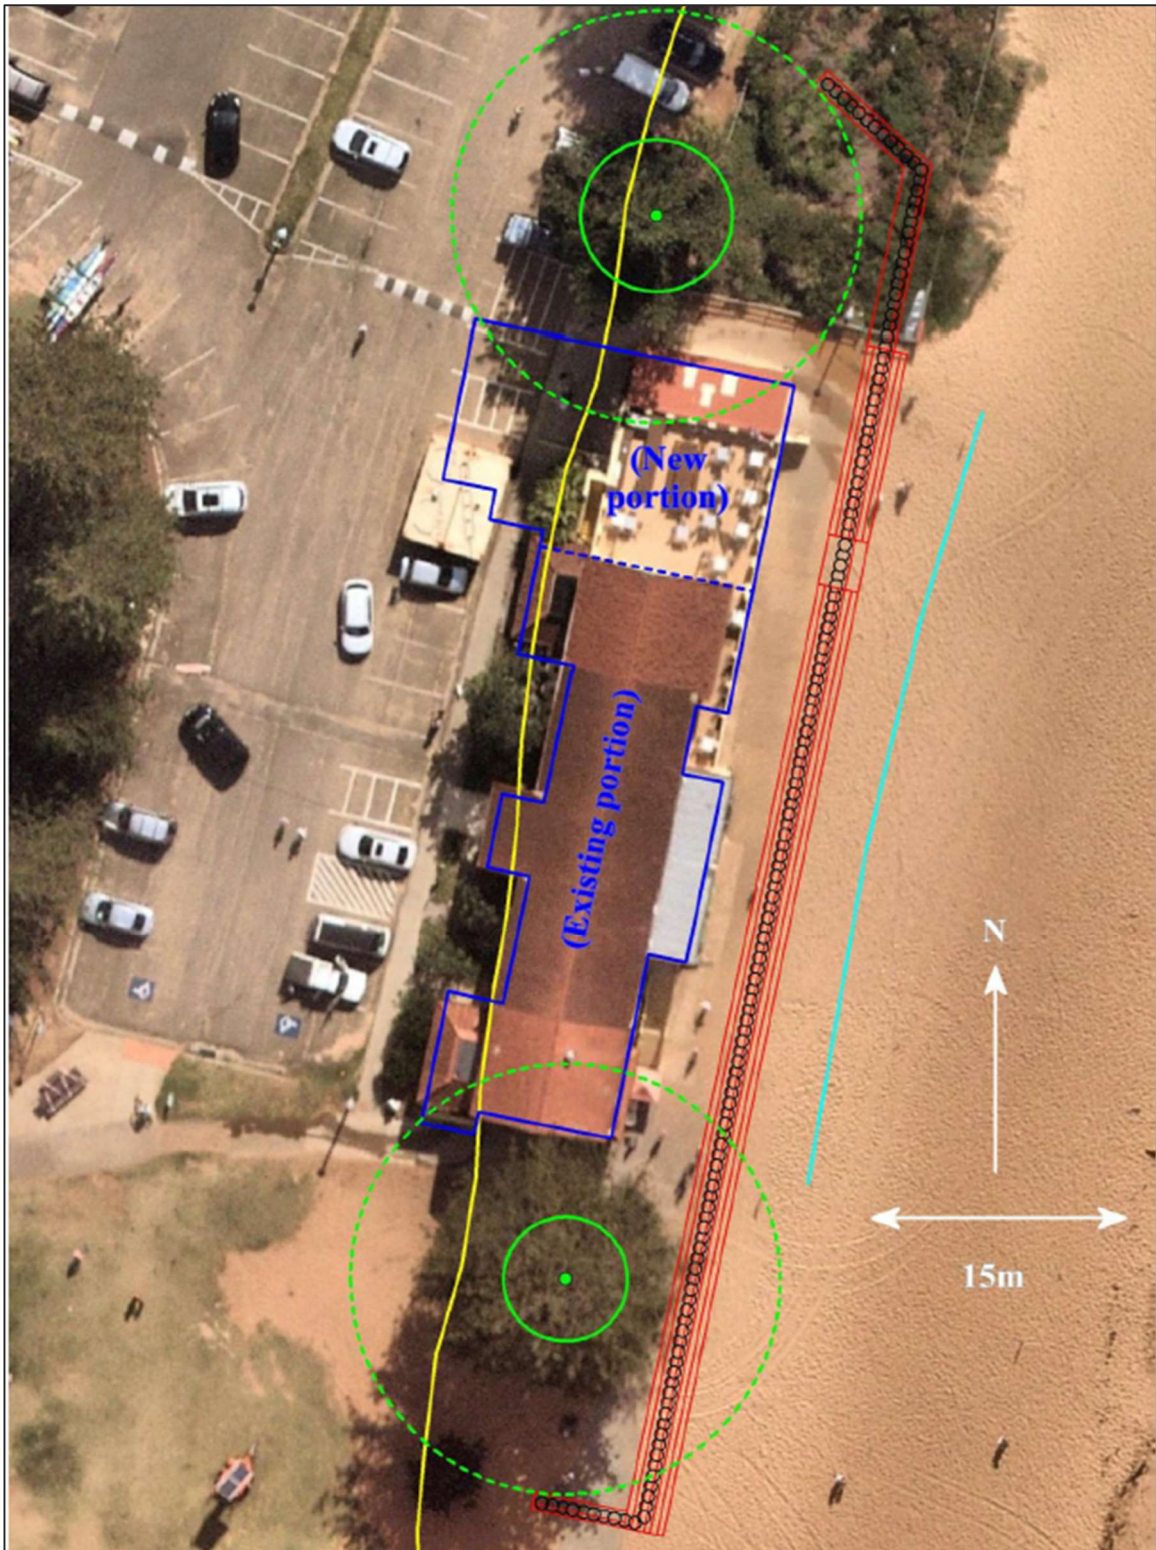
Layout of proposed seawall and SLSC building alterations (source: Horton, 2021b)
